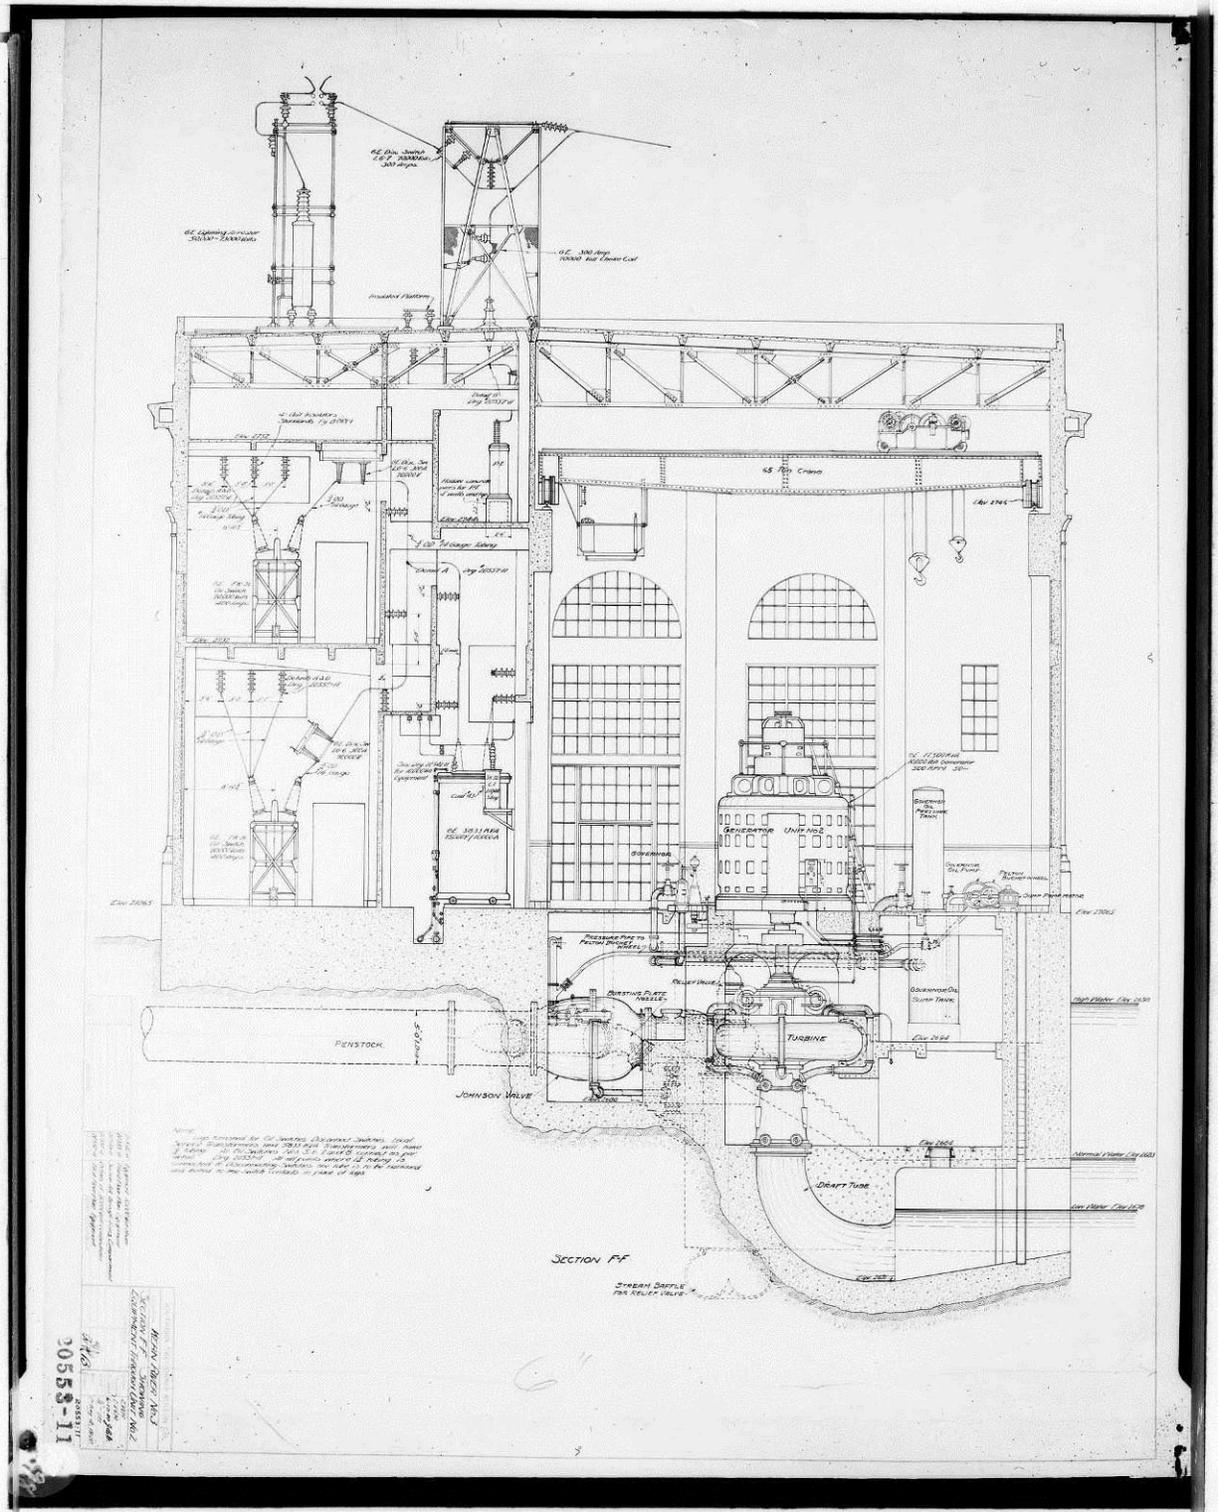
"Section F-F, Showing Equipment through Unit No. 2." 1920. Drawing #20553-11.
